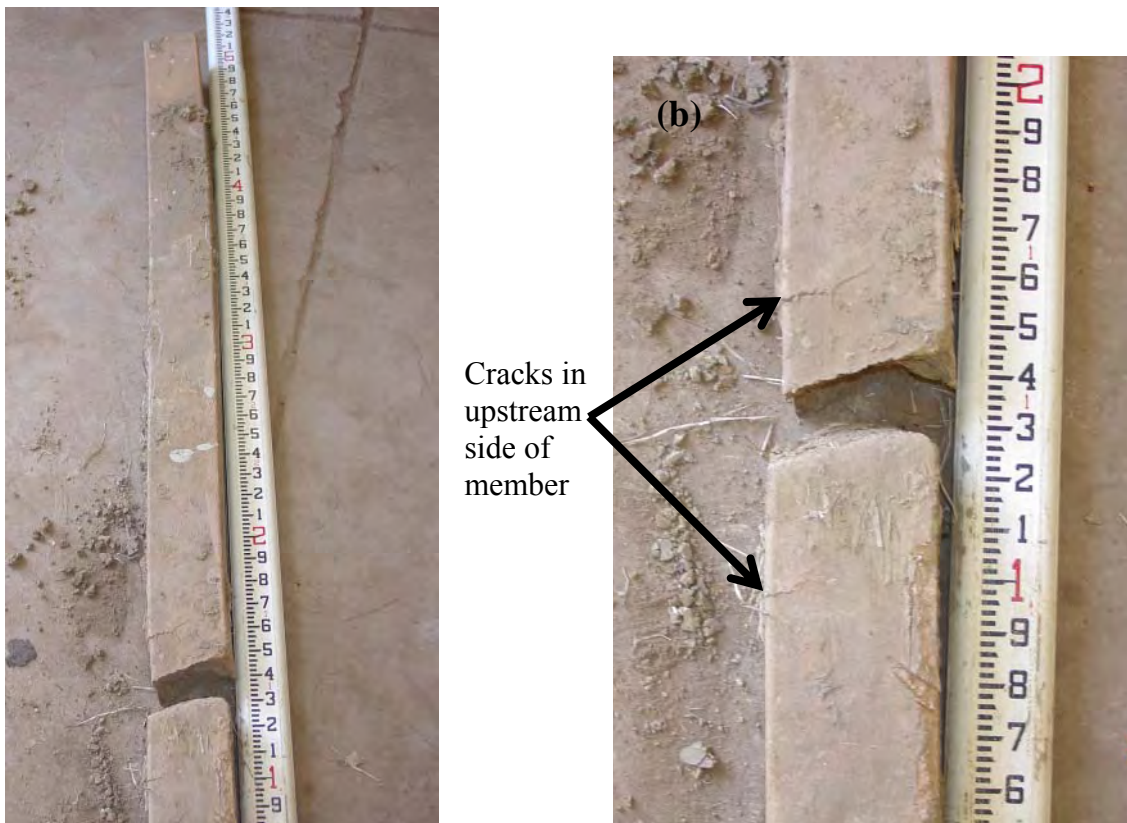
Photograph of member M-1 after excavation: (a) full member and (b) close up of failed section.
